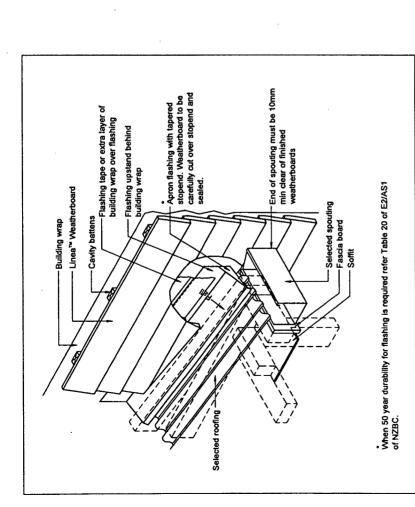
CAVITY ONE PIECE GUTTER/WALL JUNCTION
